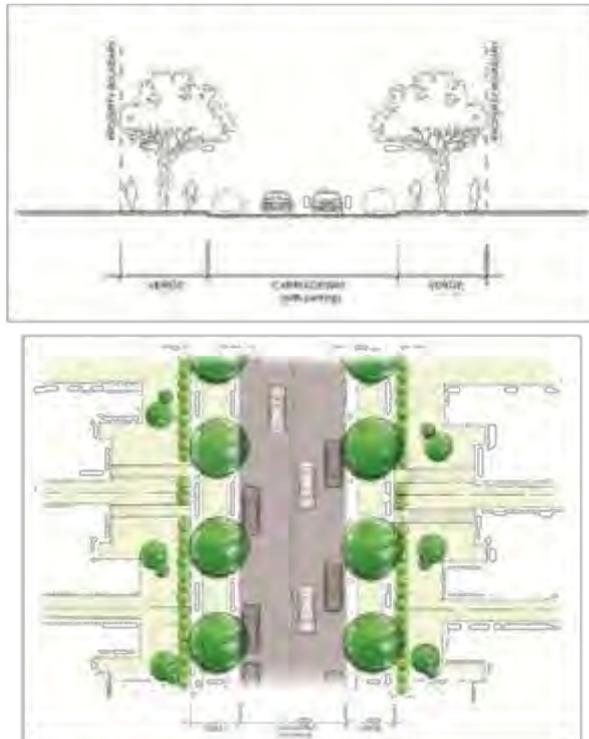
Indicative Layout of a Two Lane Sub-Arterial Road
